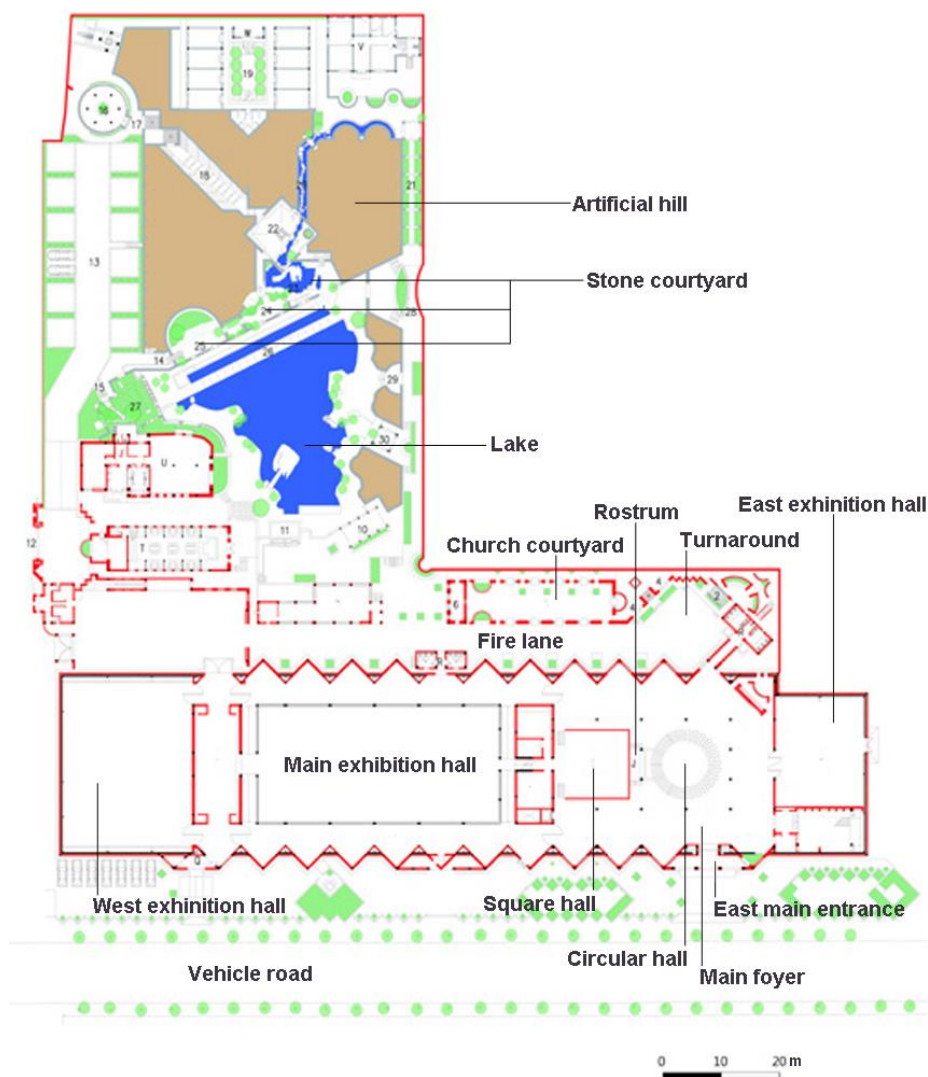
Ground-floor plan of Red Brick Art Museum and the garden.
